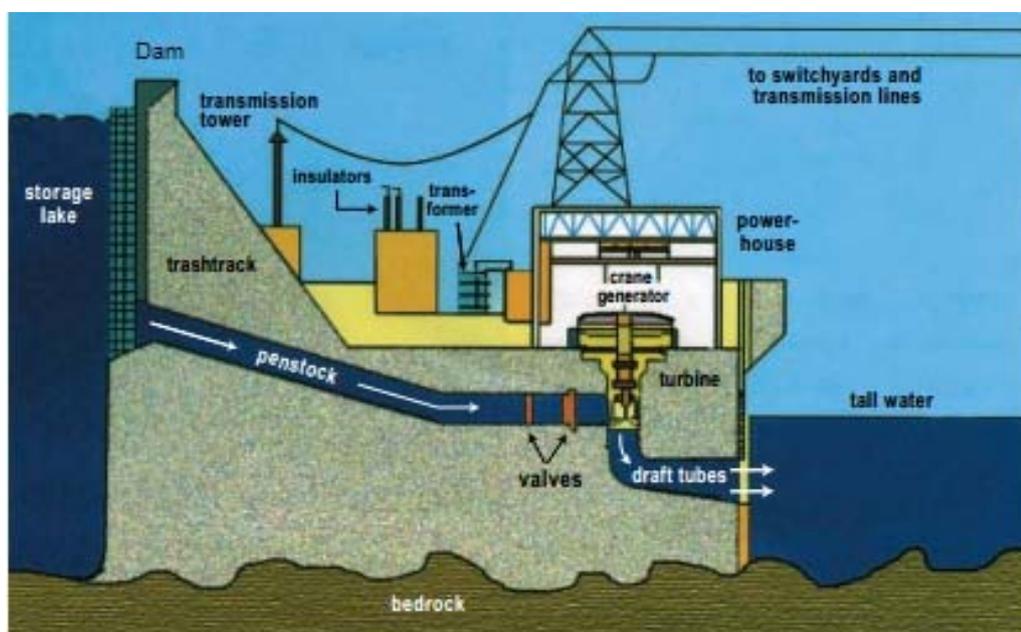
Typical storage hydropower plant with powerhouse at dam toe [158]
